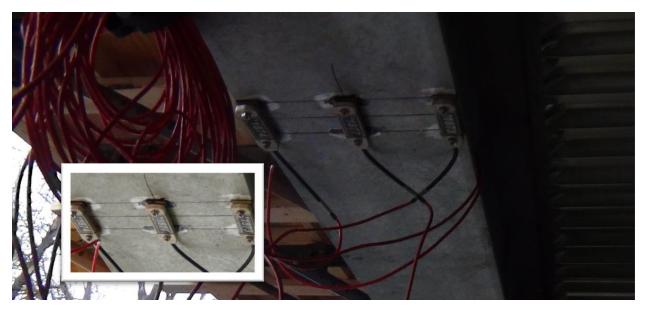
Bottom Flange Gage Locations (10' from Abutment Face)
